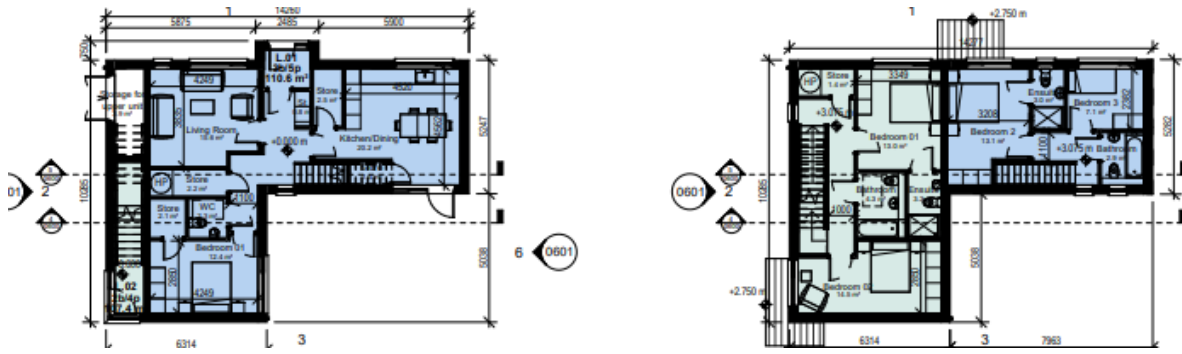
Proposed ground (left) and first (right) floor plans of Duplex Block Type L.
